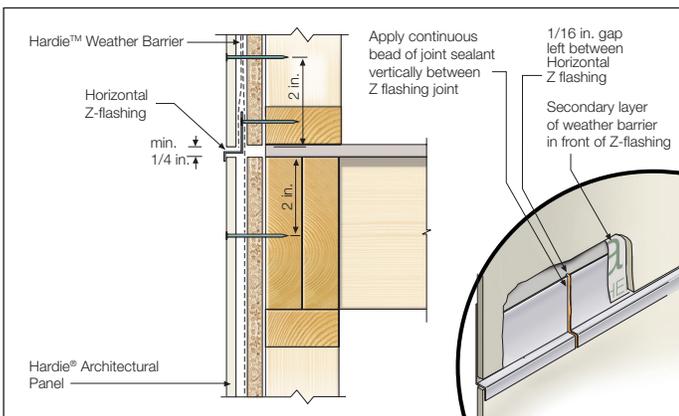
Upper Floor Junction Option 2 - Z Flashing
